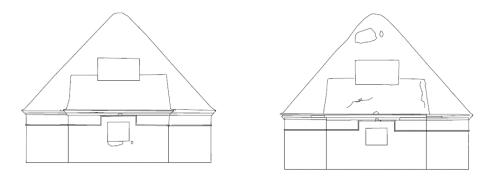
North Side Elevation (Left) South Side Elevation (Right) (Source: WCLA)
